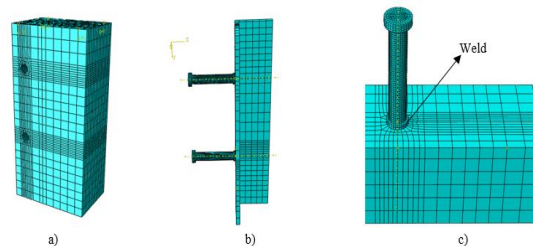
Mesh of the Model; a) Concrete Slab, b) Steel Beam with Stud, c) Shear Stud with Weld
